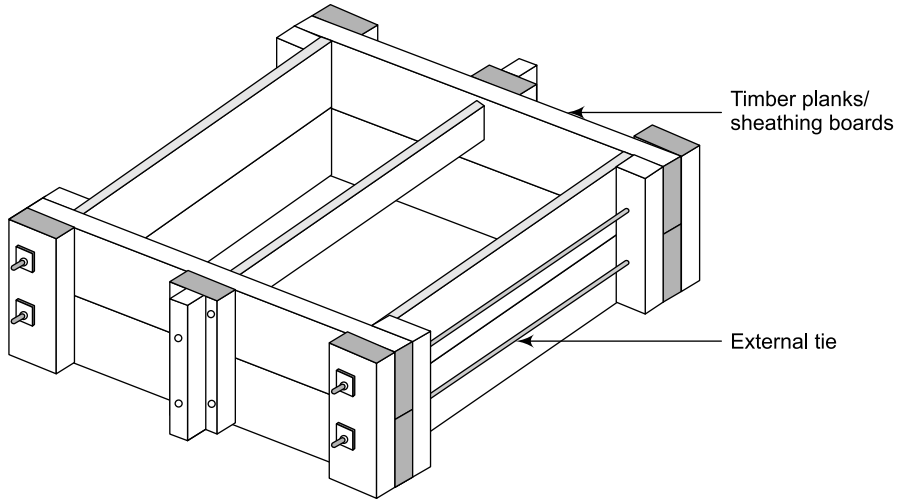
Column Footing Showing the External Tie Arrangement.
